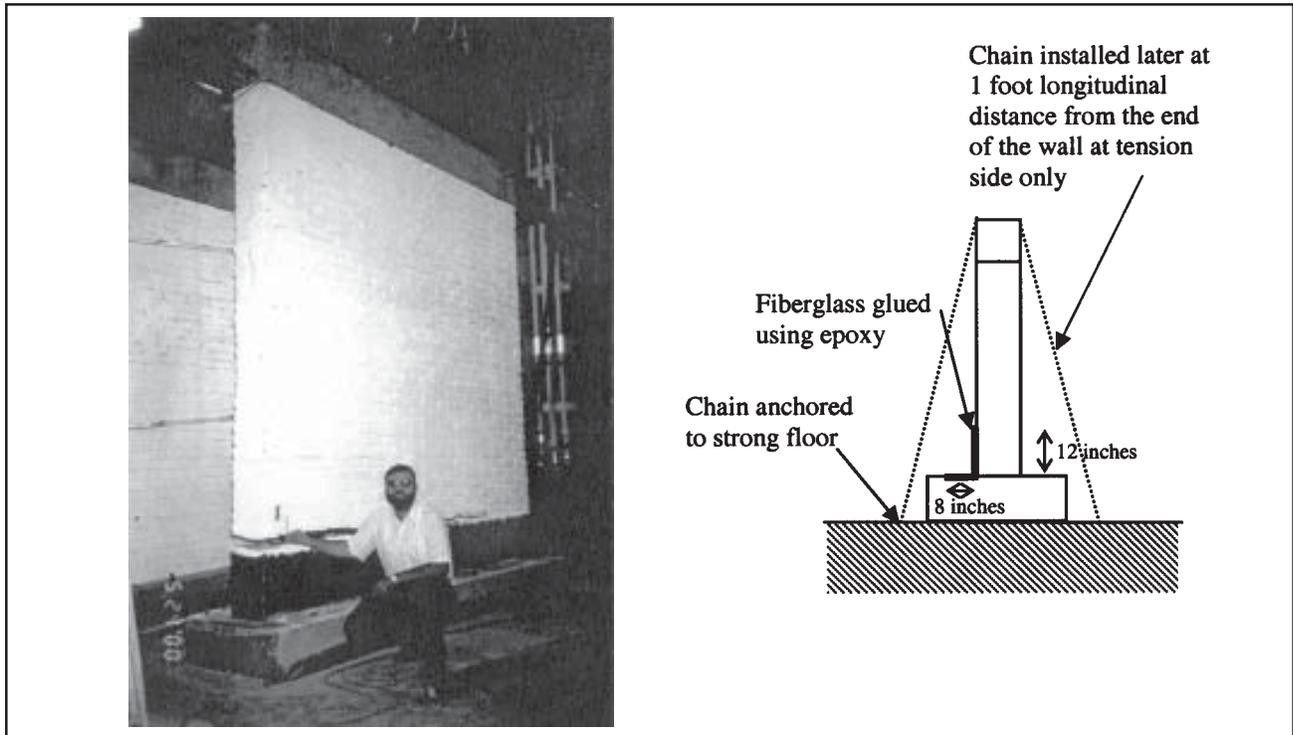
Failure of In-Plane Repaired Wall Anchored to Foundation with Fiberglass
